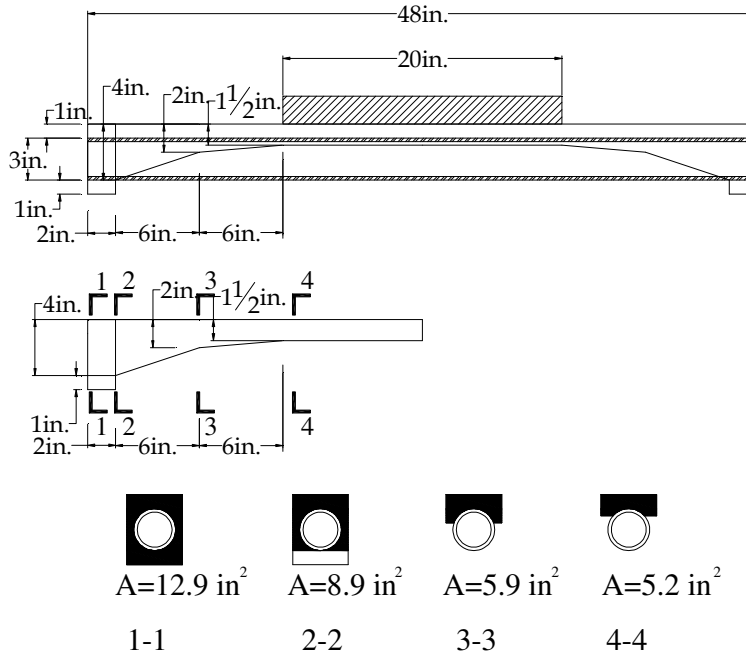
Cross Sections of Tapered Ductal®-FRP Deck Specimen
